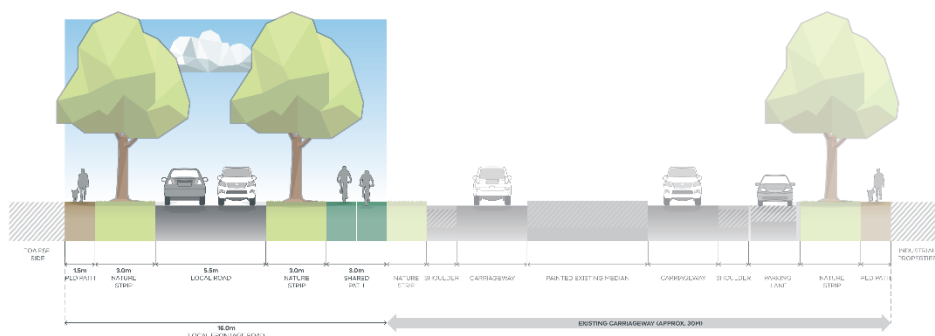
HORNE ROAD – PROPOSED CROSS-SECTION FROM RODGERS ROAD TO DALES ROAD
